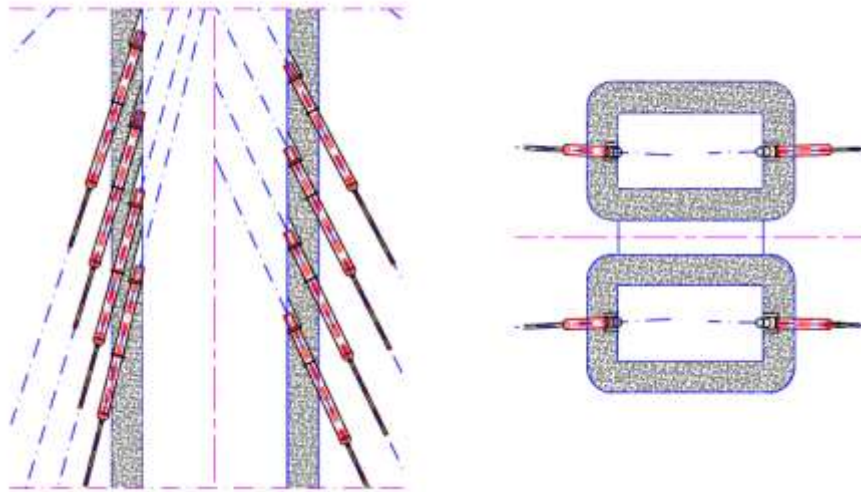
Cable attachment to pylon the lowermost cables
